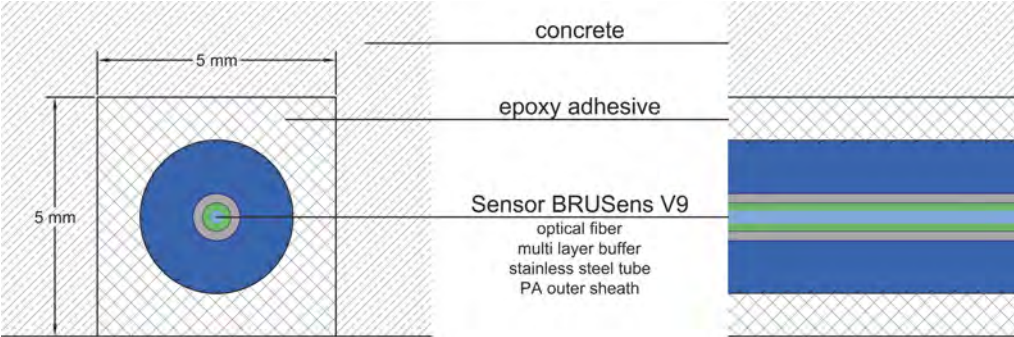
Detail of a BRUSens V9 sensor embedded in a groove; cross-section (left) and longitudinal section (right).
